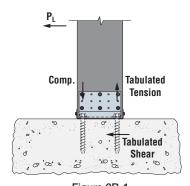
B-1 Two Anchors - One Anchor Shear, One Anchor Tension
